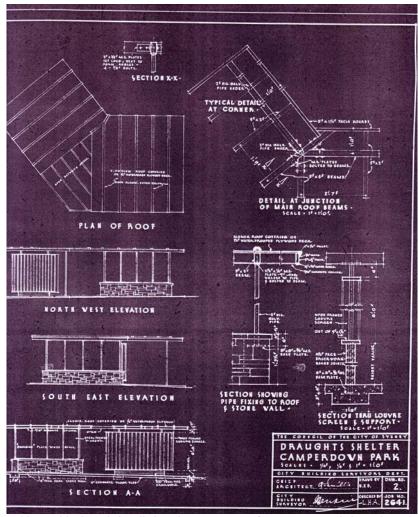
Undated detail drawings c.1950s for a proposed draughts shelter. It is not clear if this shelter was built, however a footprint of a similar structure remains in the park's south-western corner.
